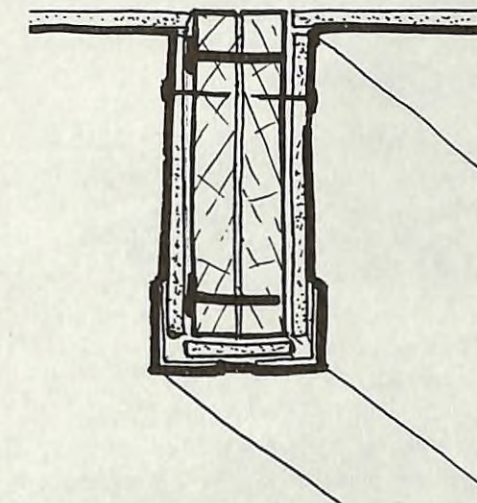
Use a floating corner at drop beams, nail drywall with a small headed nail in the upper half of the beam only (and ensure the beam is properly nailed together).
